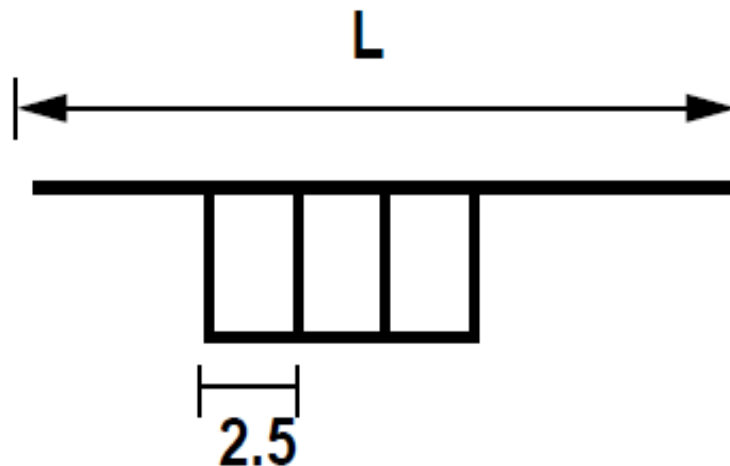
Optimal Parking Layout for 90°-angular Parking System
